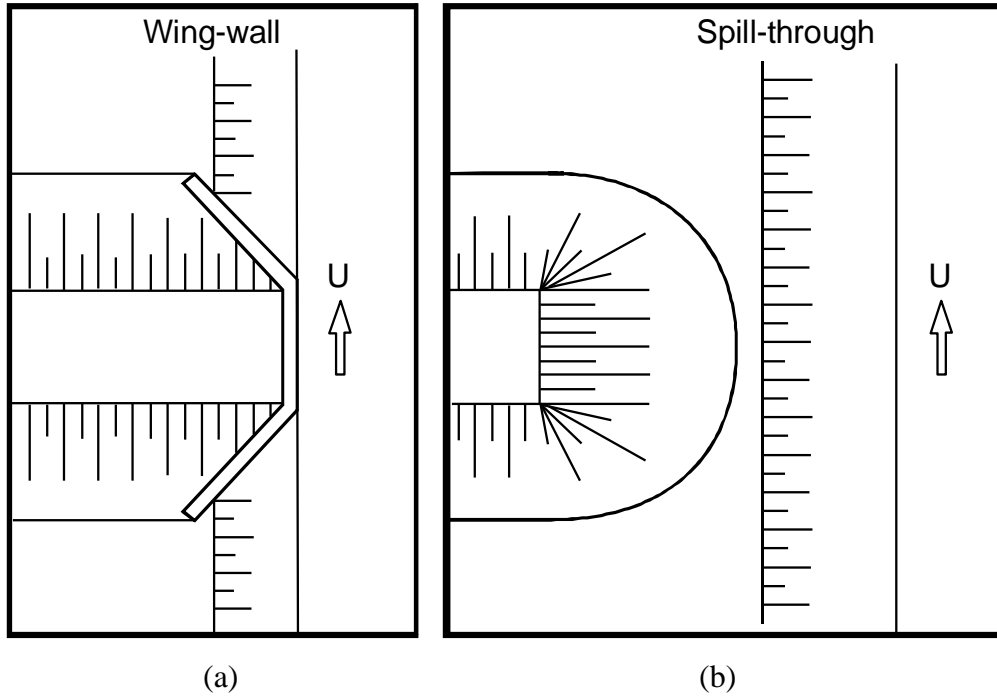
Plan views of the two common abutment forms: wing-wall abutment (a), and spill-through abutment (b)
